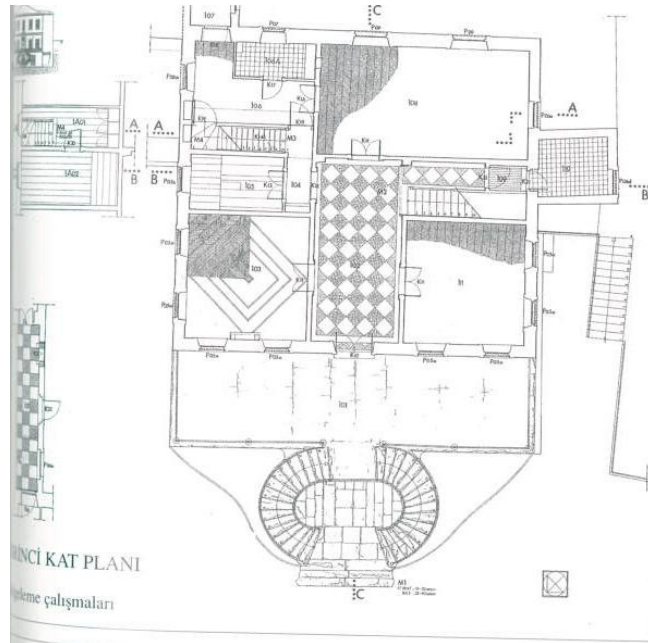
The ground floor plan of Latife Hanım House in Köprü.
